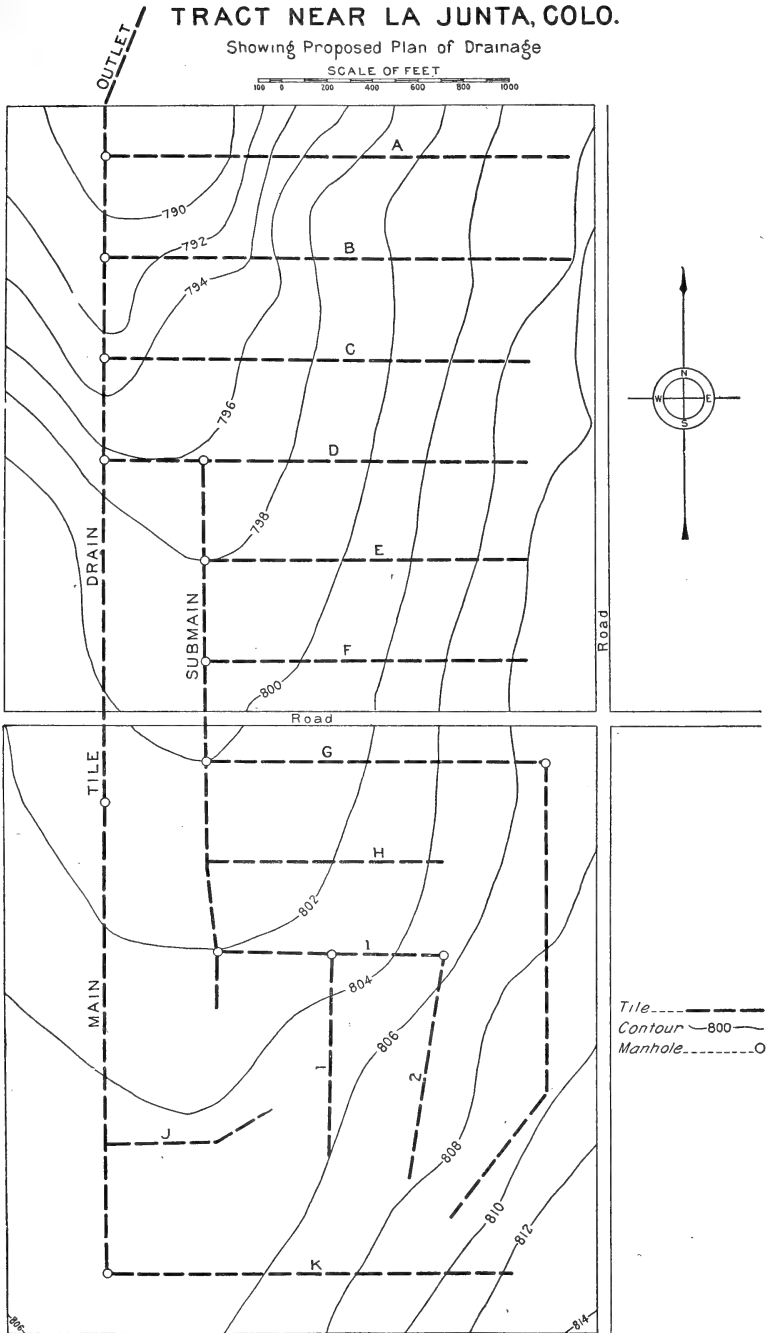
Tract near La Junta, Colo., showing proposed plan of drainage.
